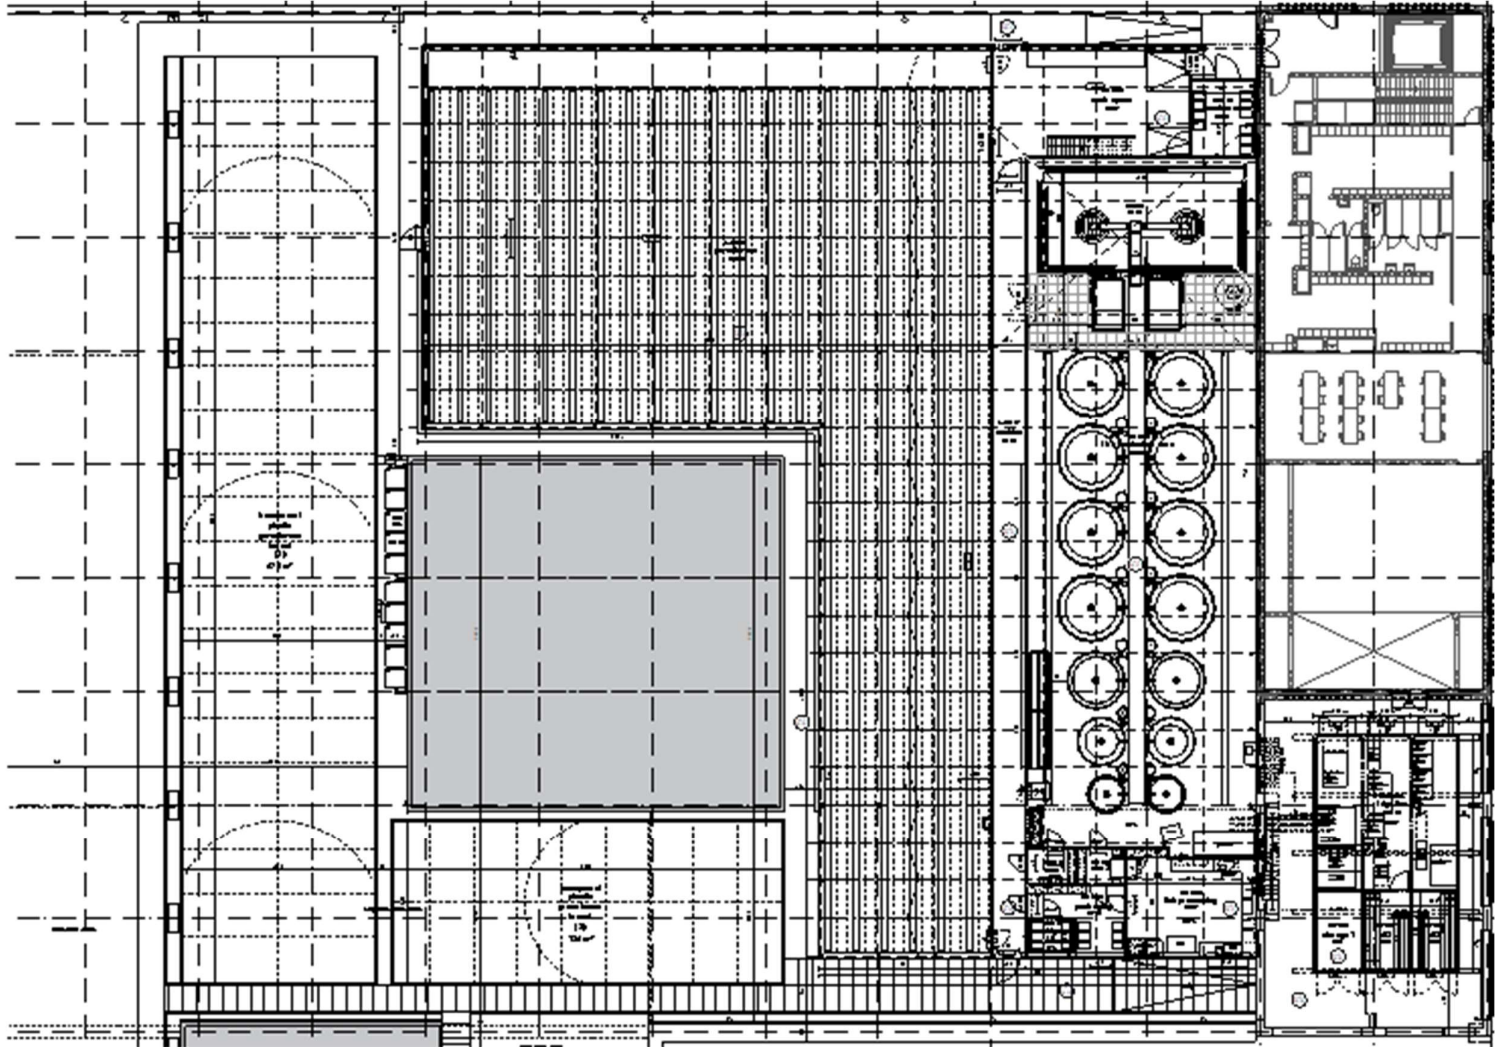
BIGH Ferme Abattoir, Brussels, Belgium, New construction rooftop layout. Source: Lateral Thinking Factory 2018
